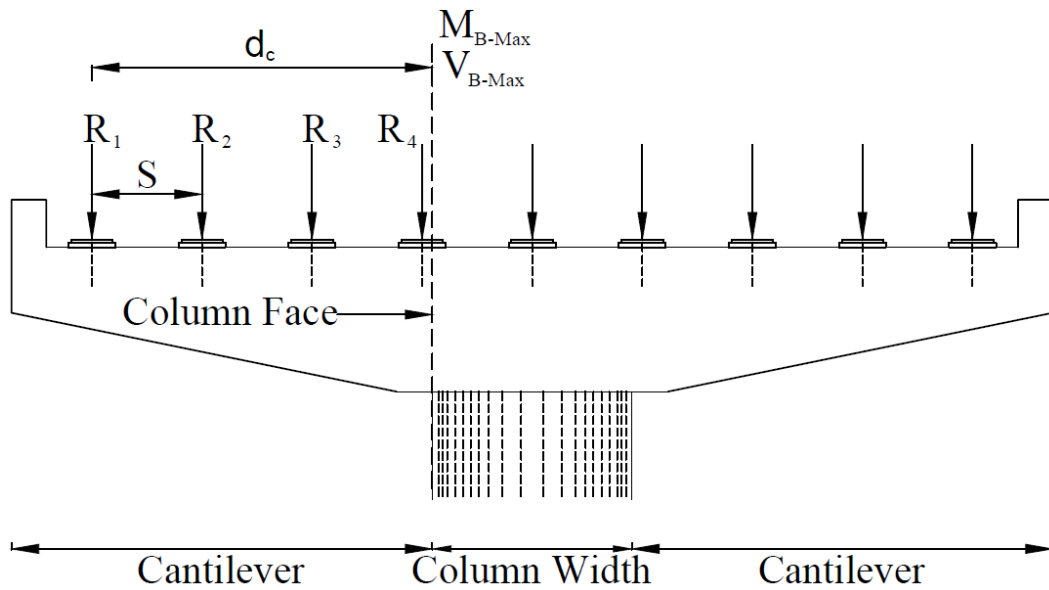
Girder live load reaction forces on a typical hammer-head pier
